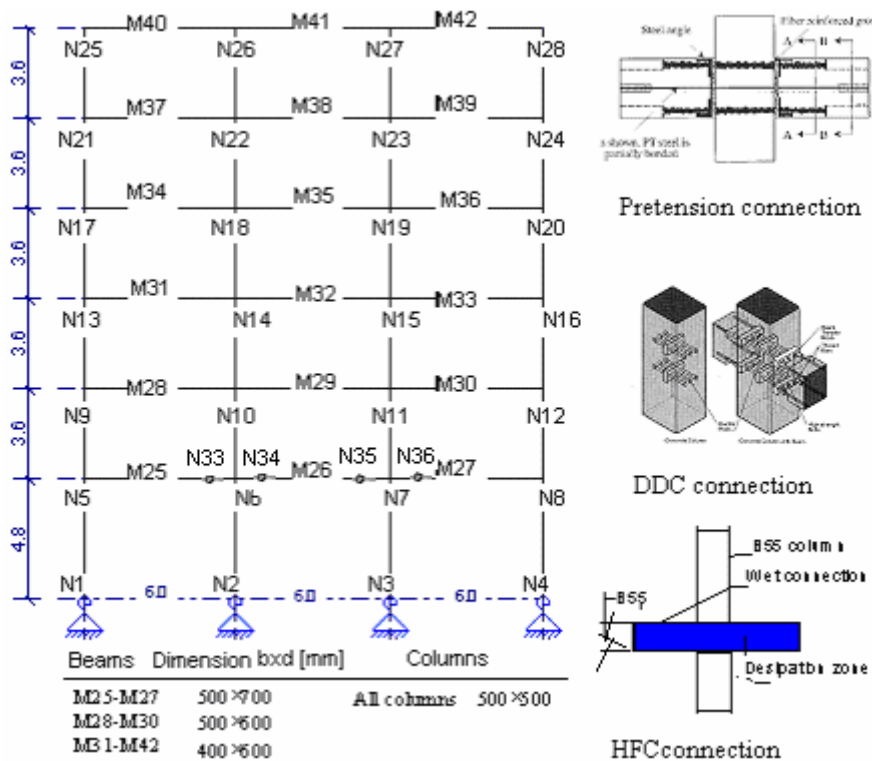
The building structure with beams columns, of DDC ductile Connectors, post tension assemblage, and HFC connection, dimension in [mm]
